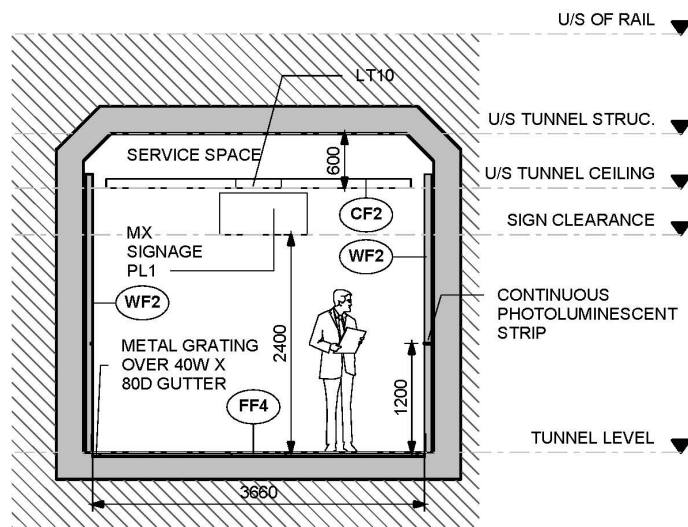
Tunnel cross section (Reference DRM Figure D-10 for construction profile of Tunnel.)
